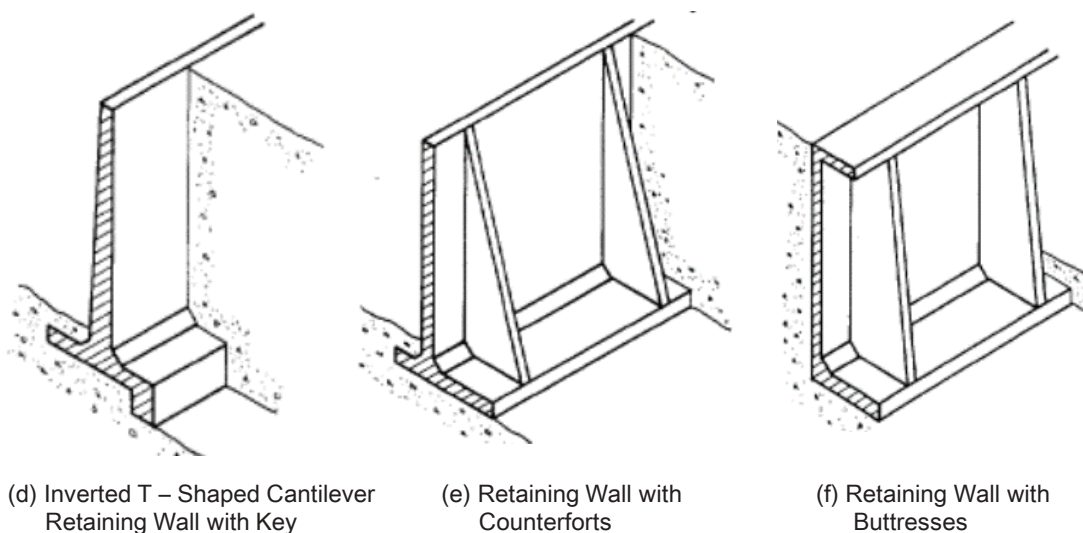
Types of Reinforced Concrete Retaining Walls
